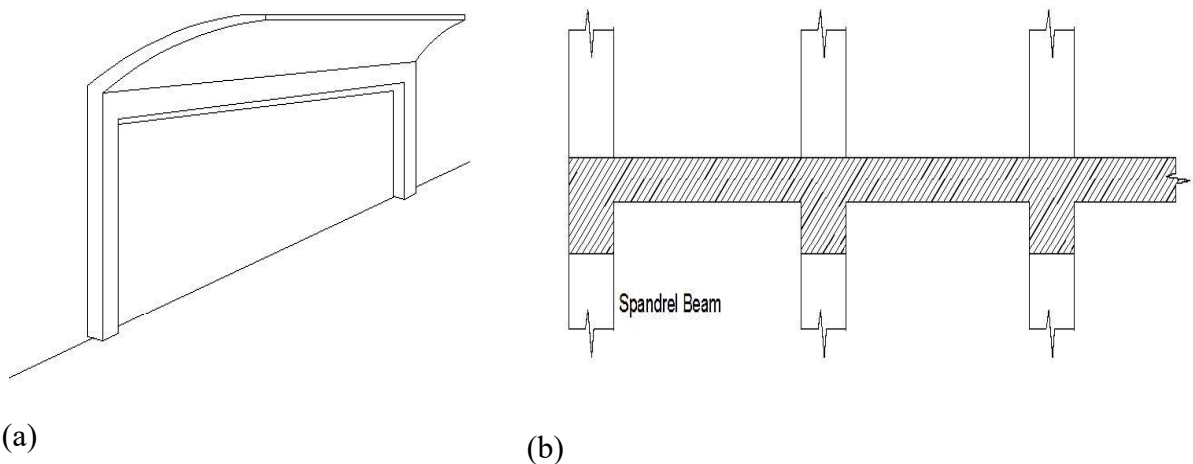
(a) Cantilever canopy, (b) Spandrel beam, (Ghoeim, Mihilmy, 2007)
